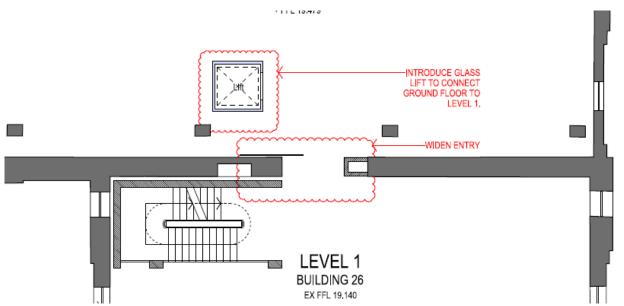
Location of the widened opening. Note the proposed amends the width of an approved opening. Source: Tzannes, "Level 1 Floor Plan", 16.05.2022, Revision H.
